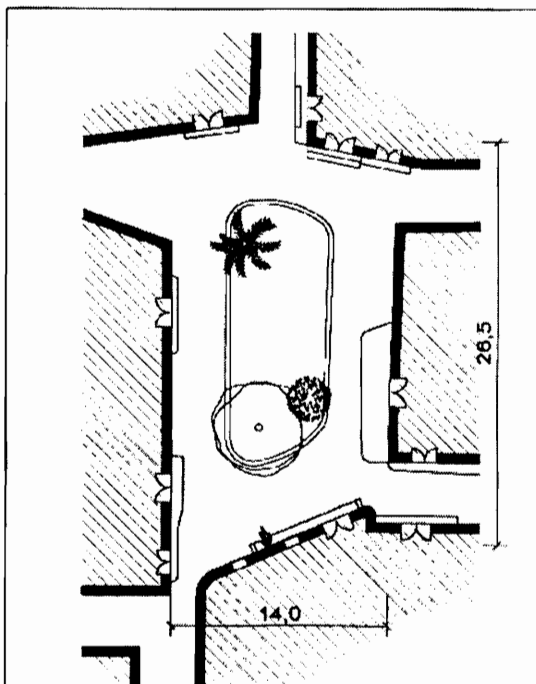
Plan of a typical small square in Stone Town (surveyed and drawn: Steyn).
